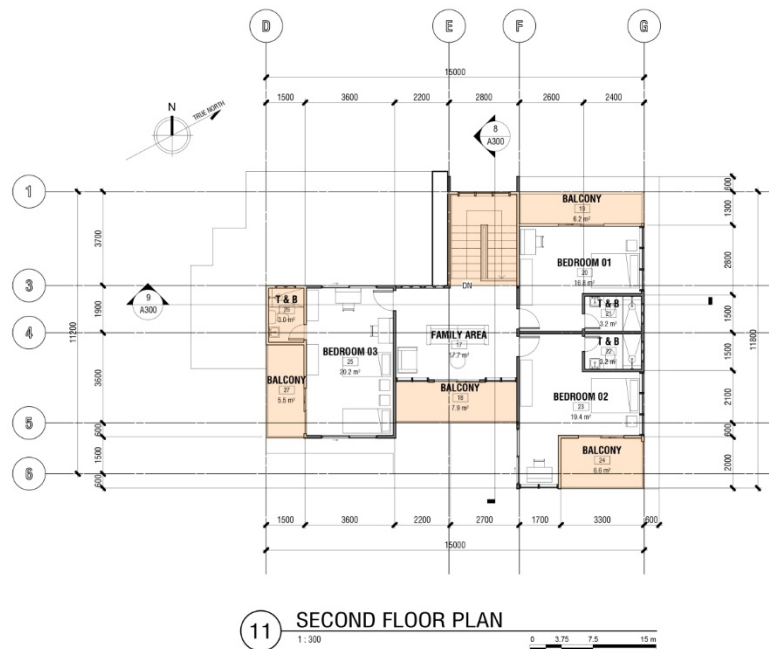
The Ground Floor Plan highlighting Buffer Zones in orange color.*Figure 04 The Second Floor Plan highlighting Buffer Zones in orange color.
